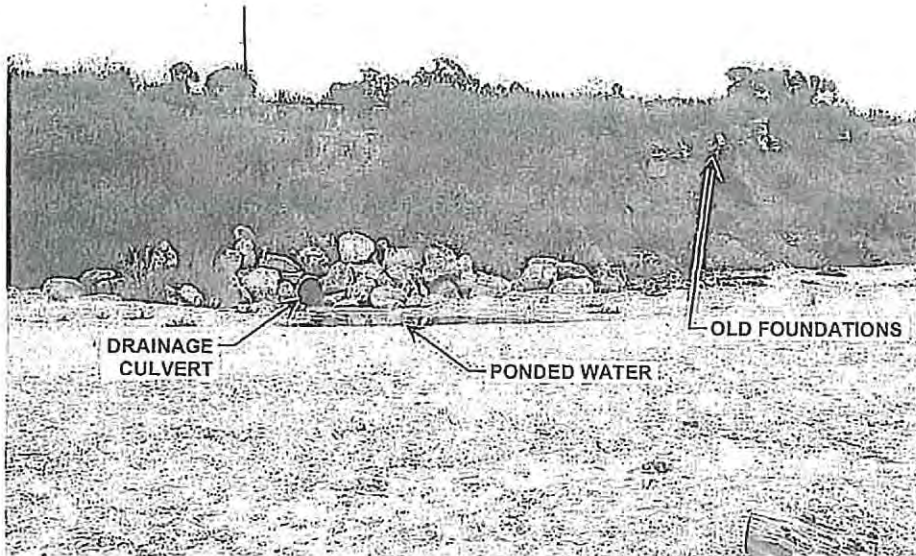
Heavily vegetated slope with concrete debris, viewed to north.
